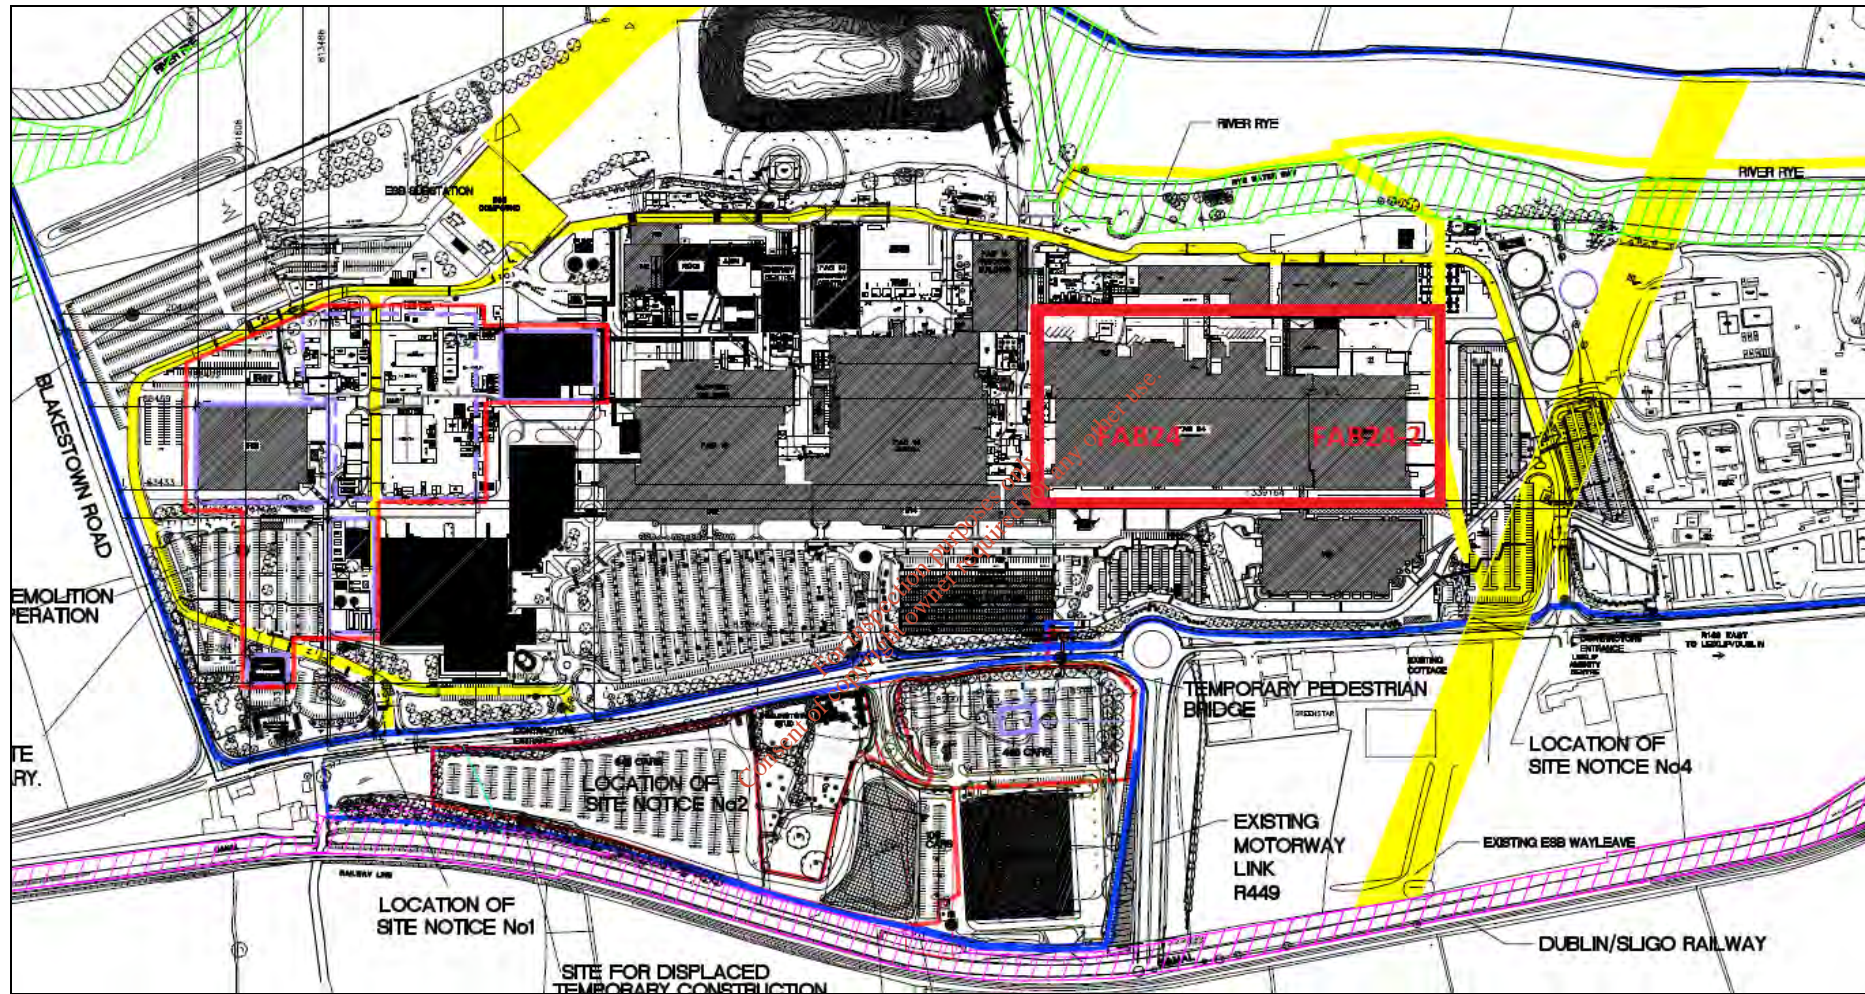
Location of FAB 24 building within Intel plant (provided by Jacobs Engineering)
